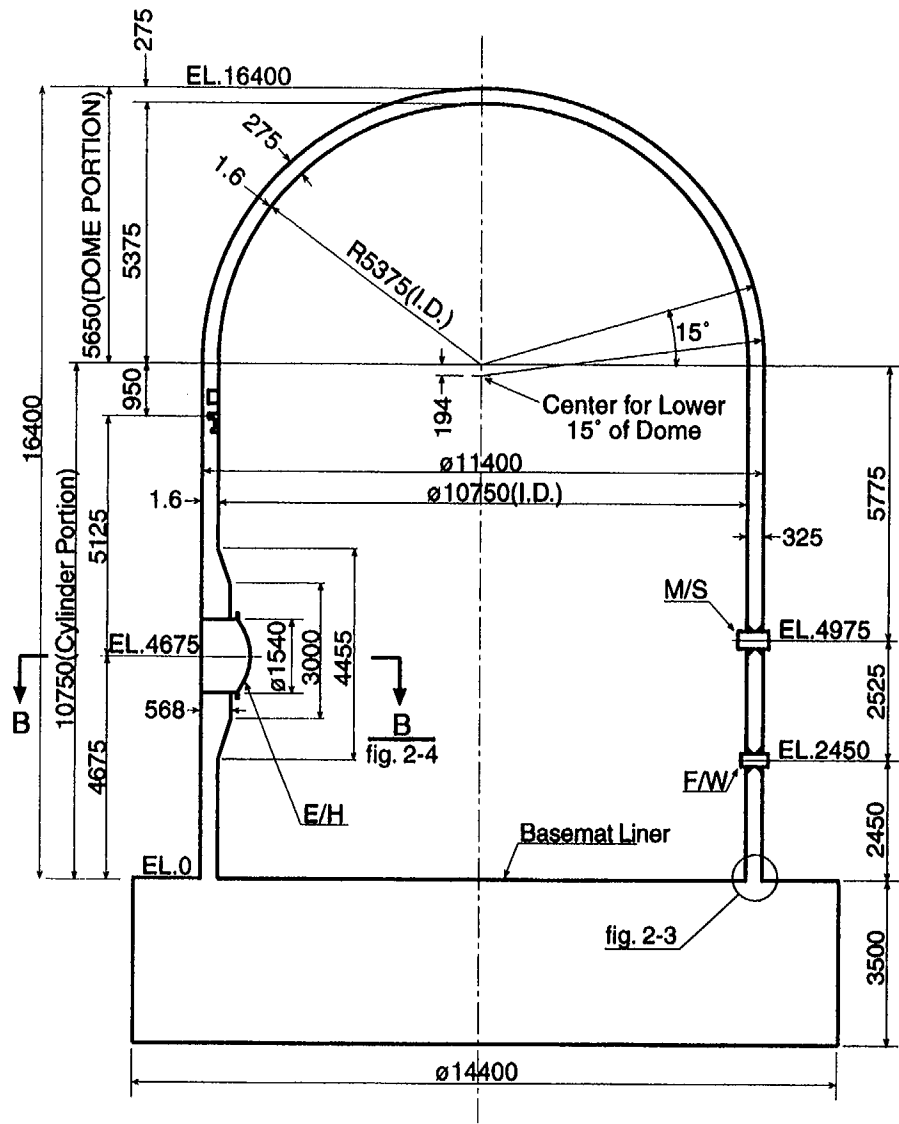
1:4-Scale Prestressed Concrete Containment Vessel (PCCV) Model Geometry (Dimensions in mm)
